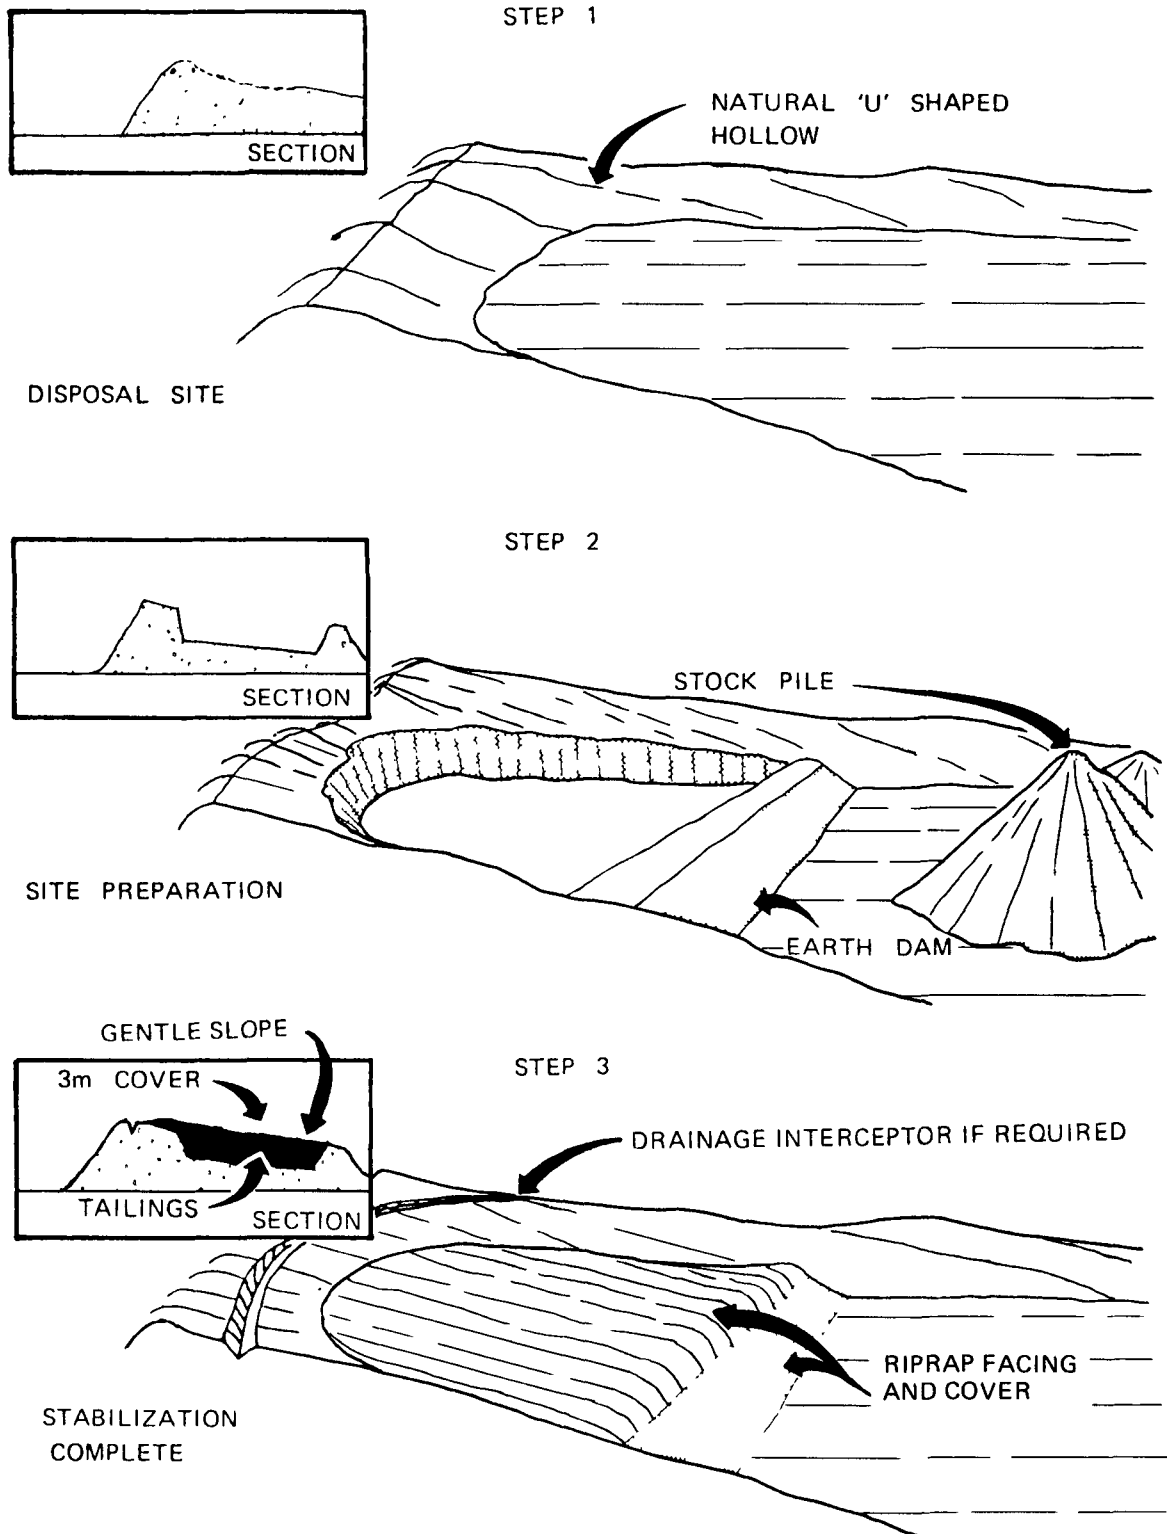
SCHEMATIC OF TYPICAL TAILINGS DISPOSAL SITE
